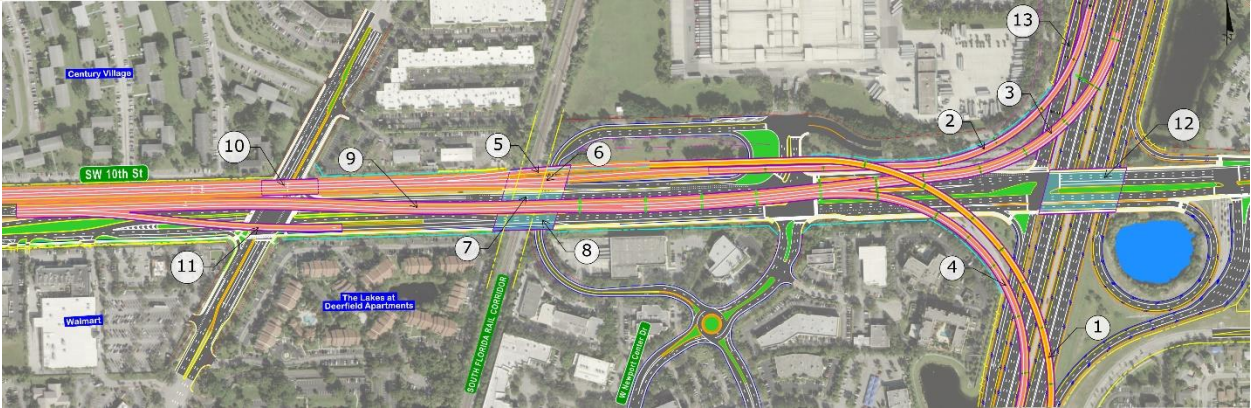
8: Proposed Bridge Locations (1 of 3)
